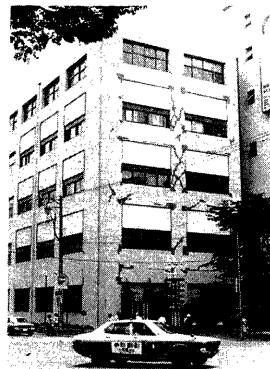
Shear cracks in beam-to-column connection panels.
